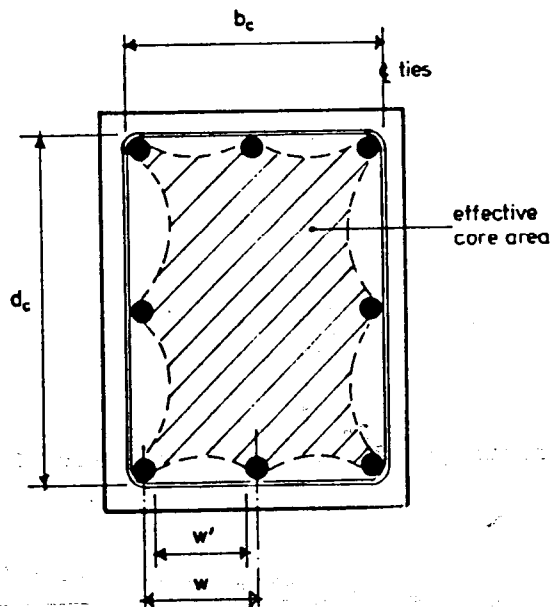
Confinement of Concrete for Rectangular Sections.
